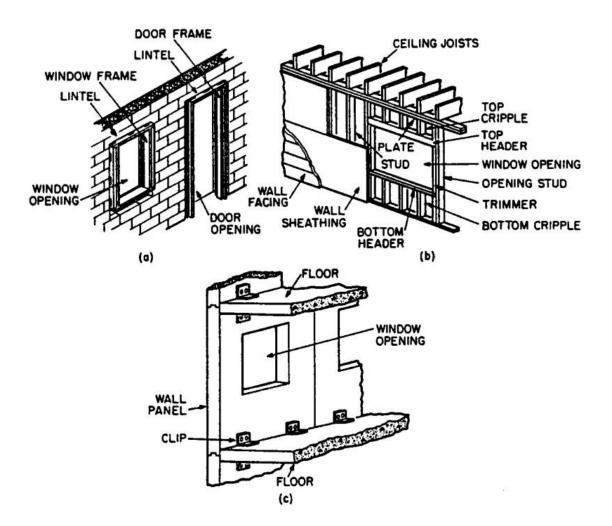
Types of exterior wall construction: (a) concrete-block wall; (b) wood-framed wall; (c) precast-concrete curtain wall
